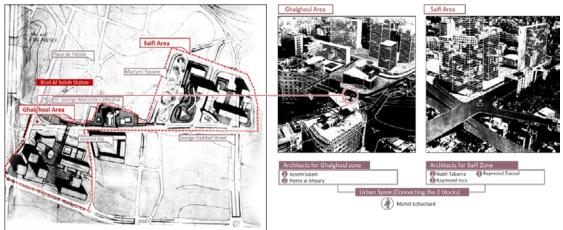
The proposed Ghalghoul and Saifi Master plan (Sourse: Eric Verdeil, https://books.openedition.org/ifpo/2176, modified by author)
